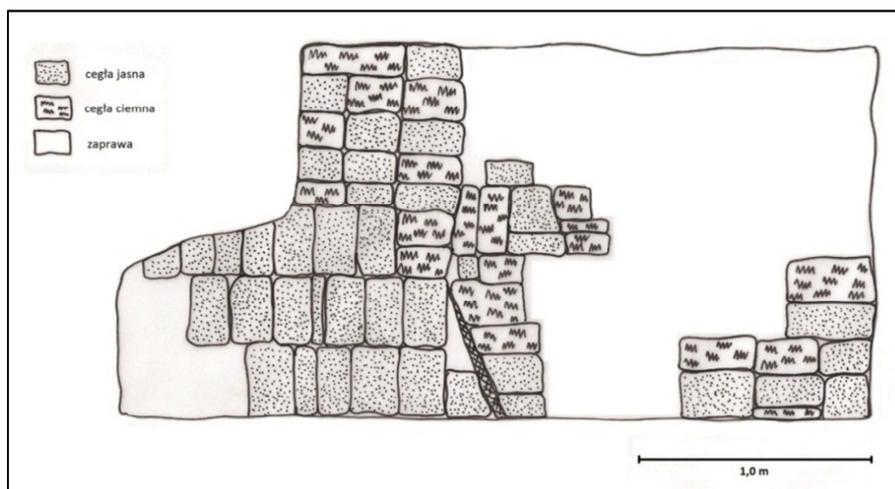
A draft of the fifth wall's fragment. (Cegła jasna- light brick, cegła ciemna – dark brick, zaprawa- daub)
